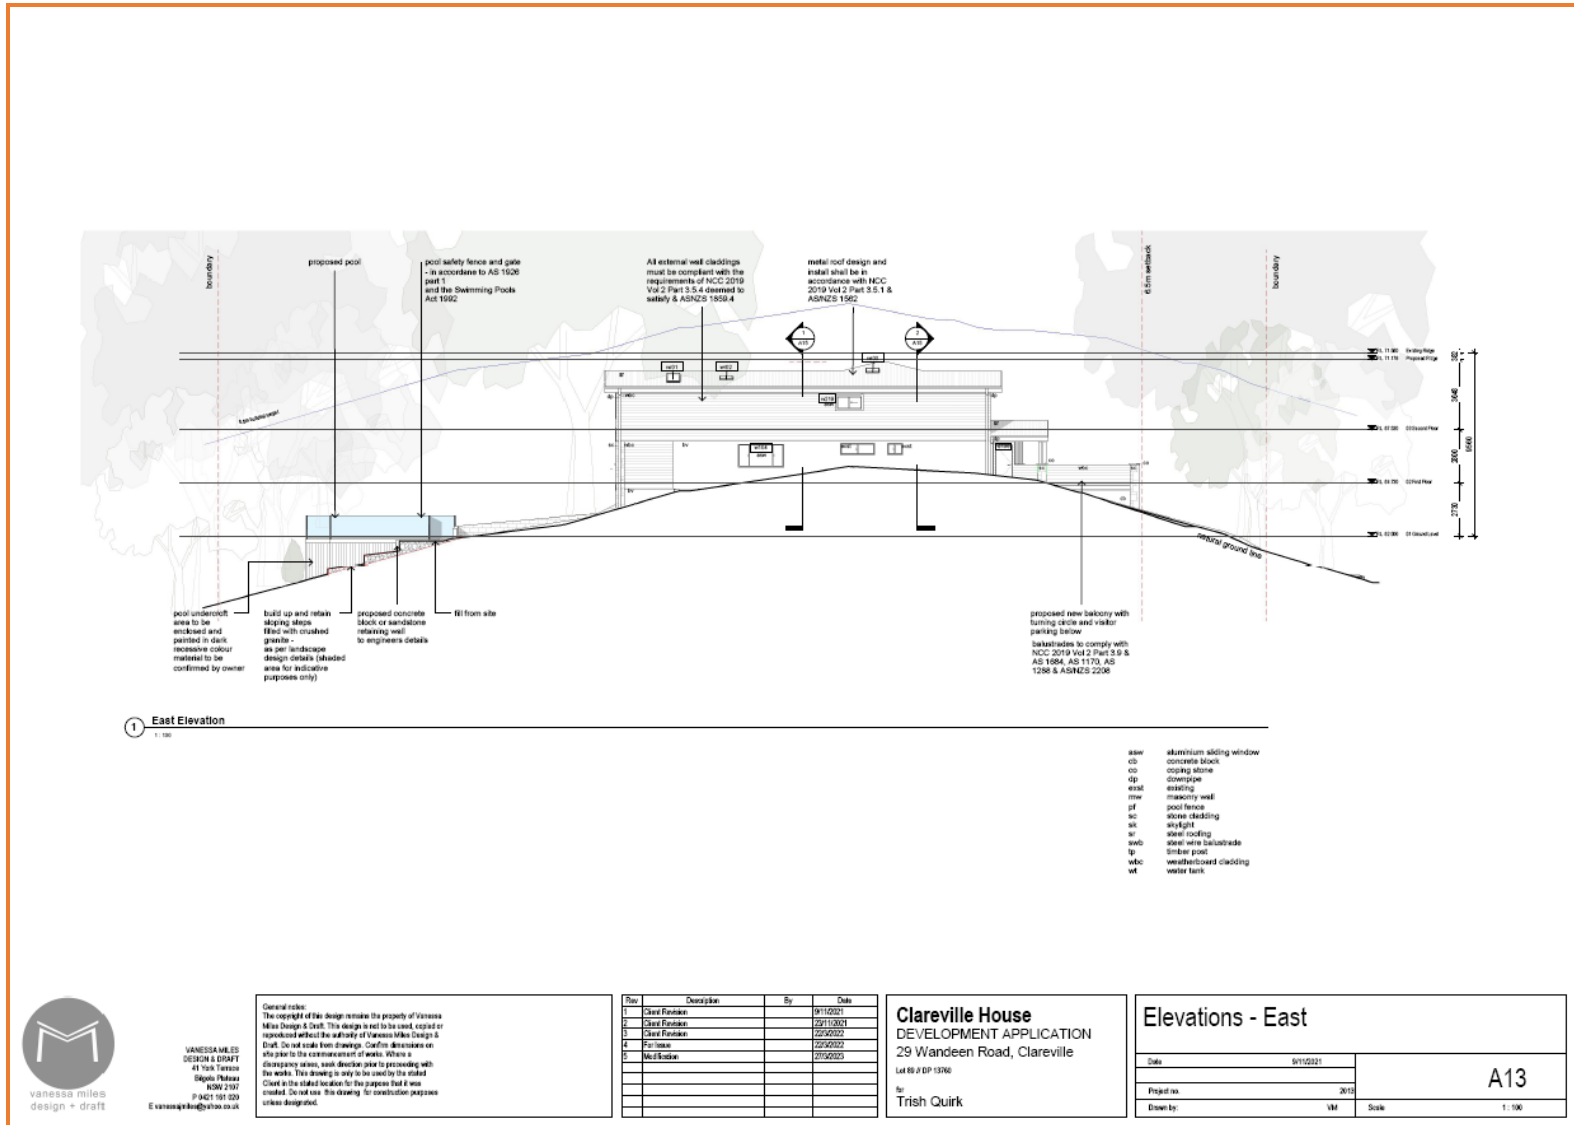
Illustrates the as proposed Elevations (previous pages 19 -20 & above).
